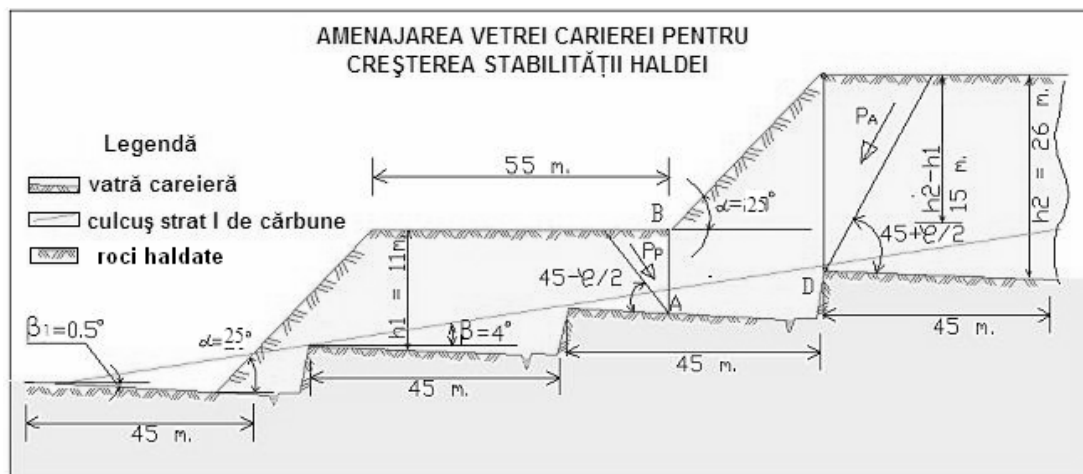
Arranging the coal pit's floor from the excavation phase to ensure the stability of dump reserve
